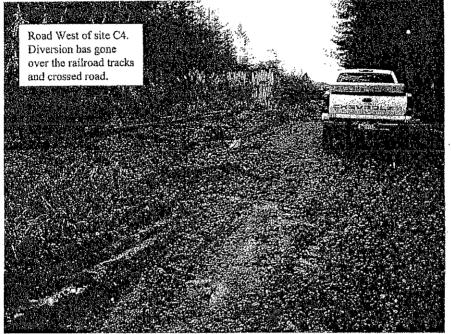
A. Site C4 Along road A 55.0167. Picture is of the outlet of Site C4 looking North.
